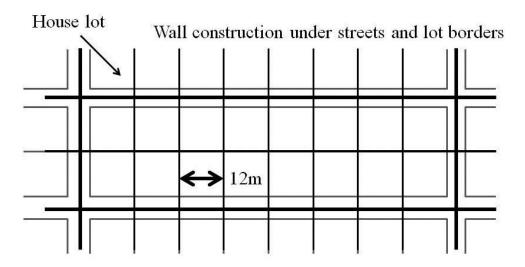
Installation plan of underground walls along both streets and housing lot boundaries
